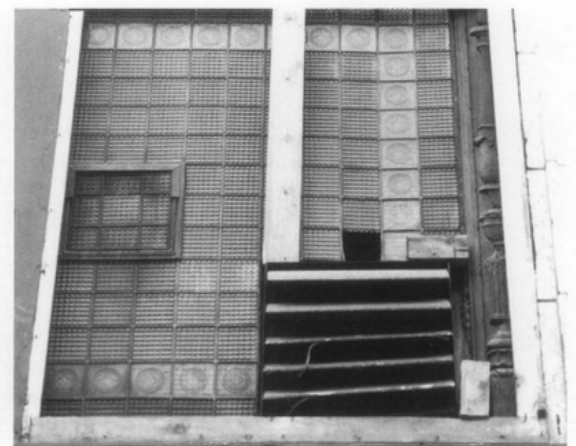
Transoms hidden beneath the plywood covers were in varying condition. Tiles had been removed from the panel above to fit a ventilation duct. When the panels were later rebuilt new material was needed to replace missing tiles. Photo: Oertel Architects.
